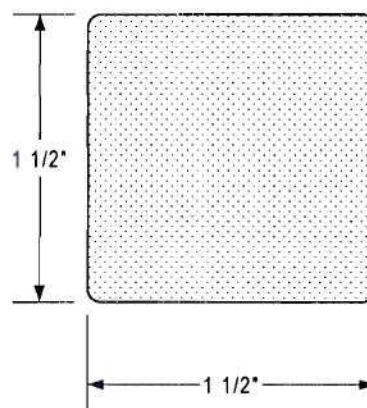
1.5-inch x 1.5-inch small-scale specimen cross section
